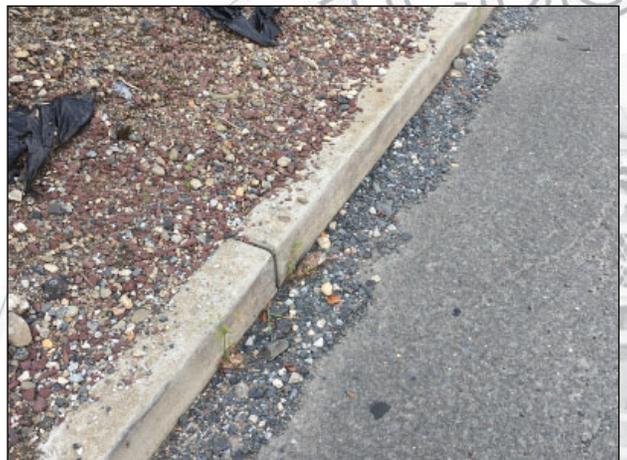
View of wall on Knickerbocker Avenue with sediment and debris falling into the public right of way and street.
